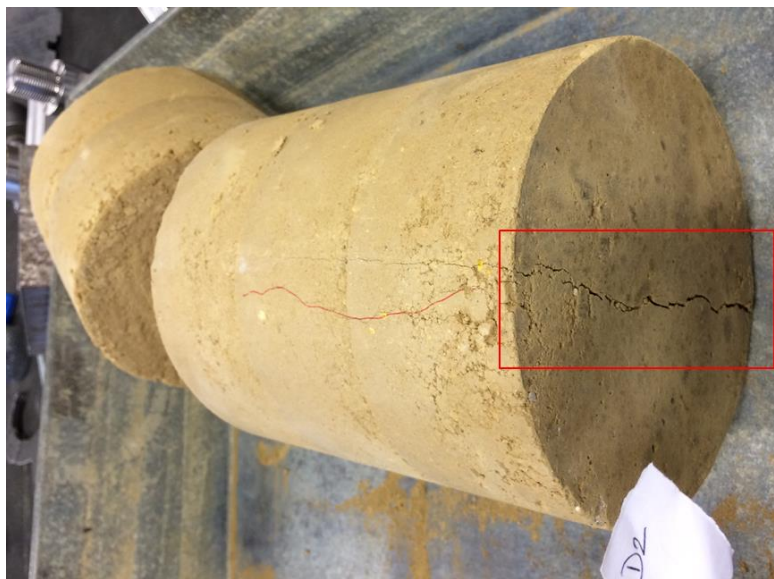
Failure of cylindrical specimens due to tensile stress
